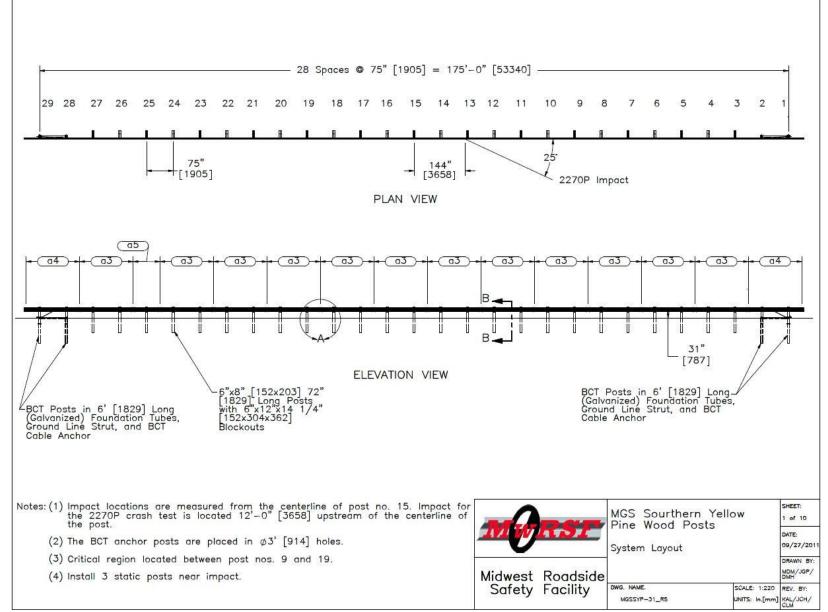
Test Installation Layout, Test No. MGSSYP-1
